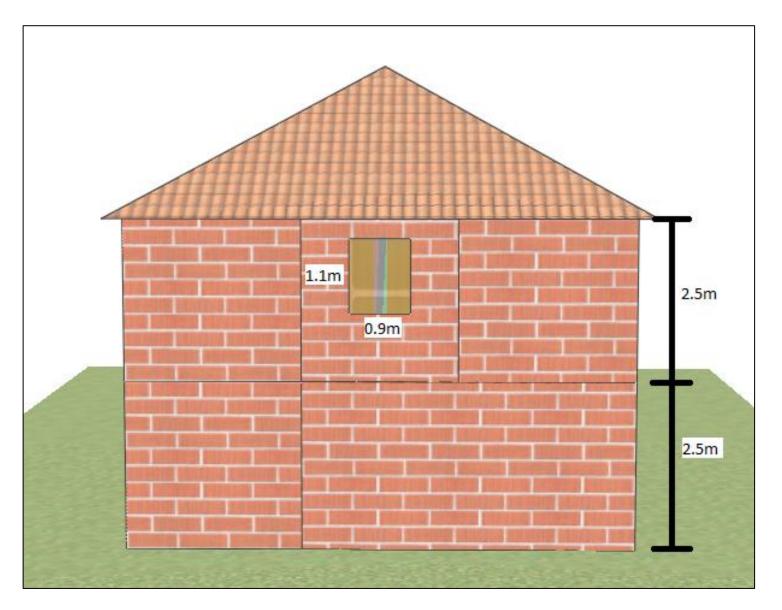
Base Case left hand side wall (west facing) wall Internal Gains and Occupancy/Electrical Profiles
